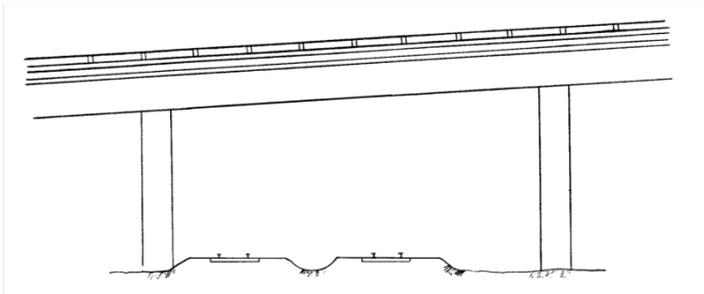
Bridge elevation view with two freight/passenger rail tracks below the bridge.
